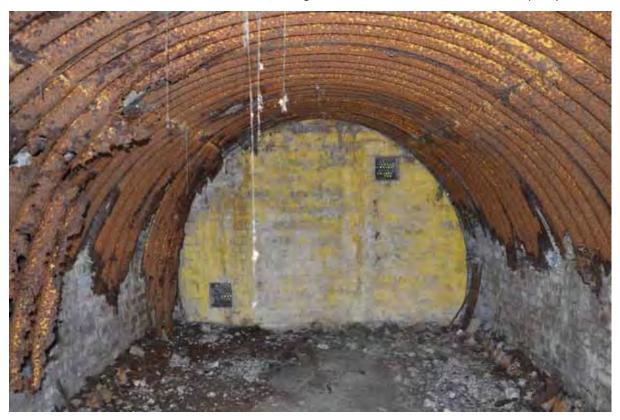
Interior of the air-raid shelter, facing south-west (600)
